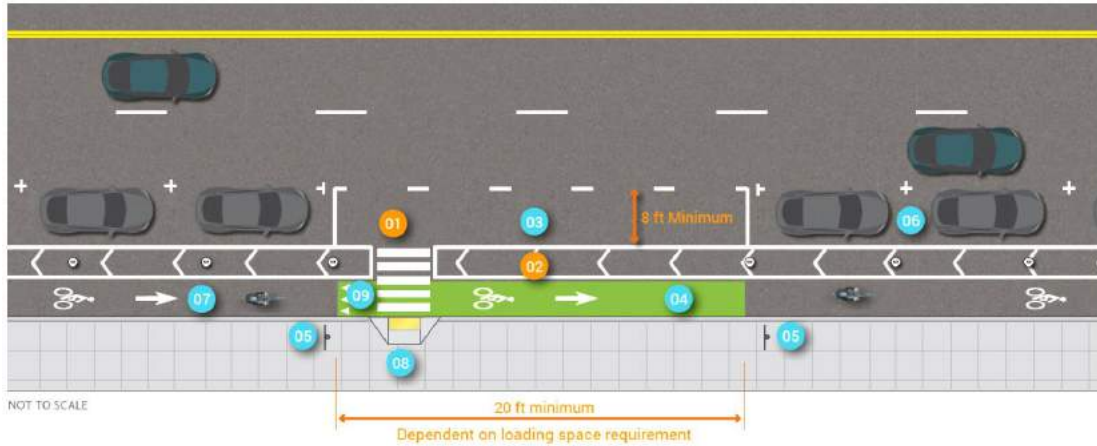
Separated bike lanes through loading zones – alternative 1 (FHWA, 2015)
